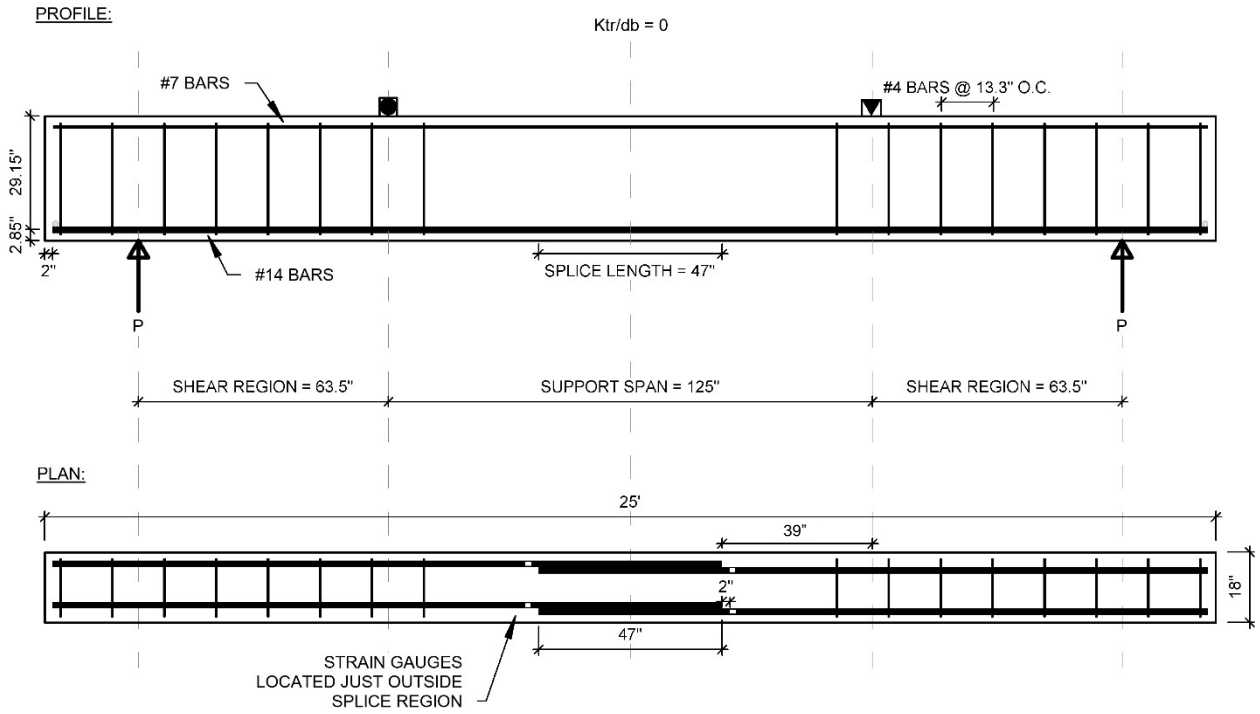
Profile and plan of 14-d (1 in. = 25.4 mm)
